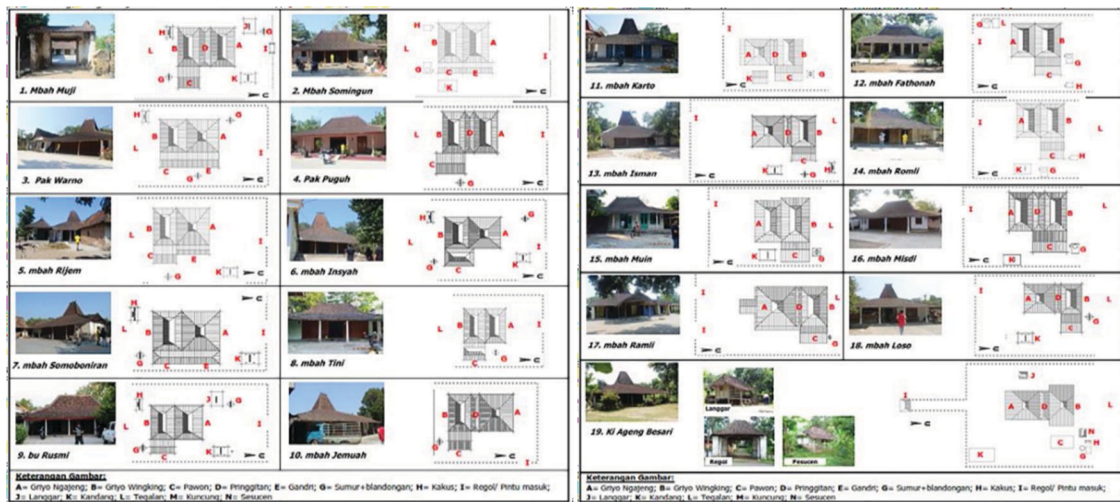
Floor Plan, and Looks of Traditional House in Kudus
